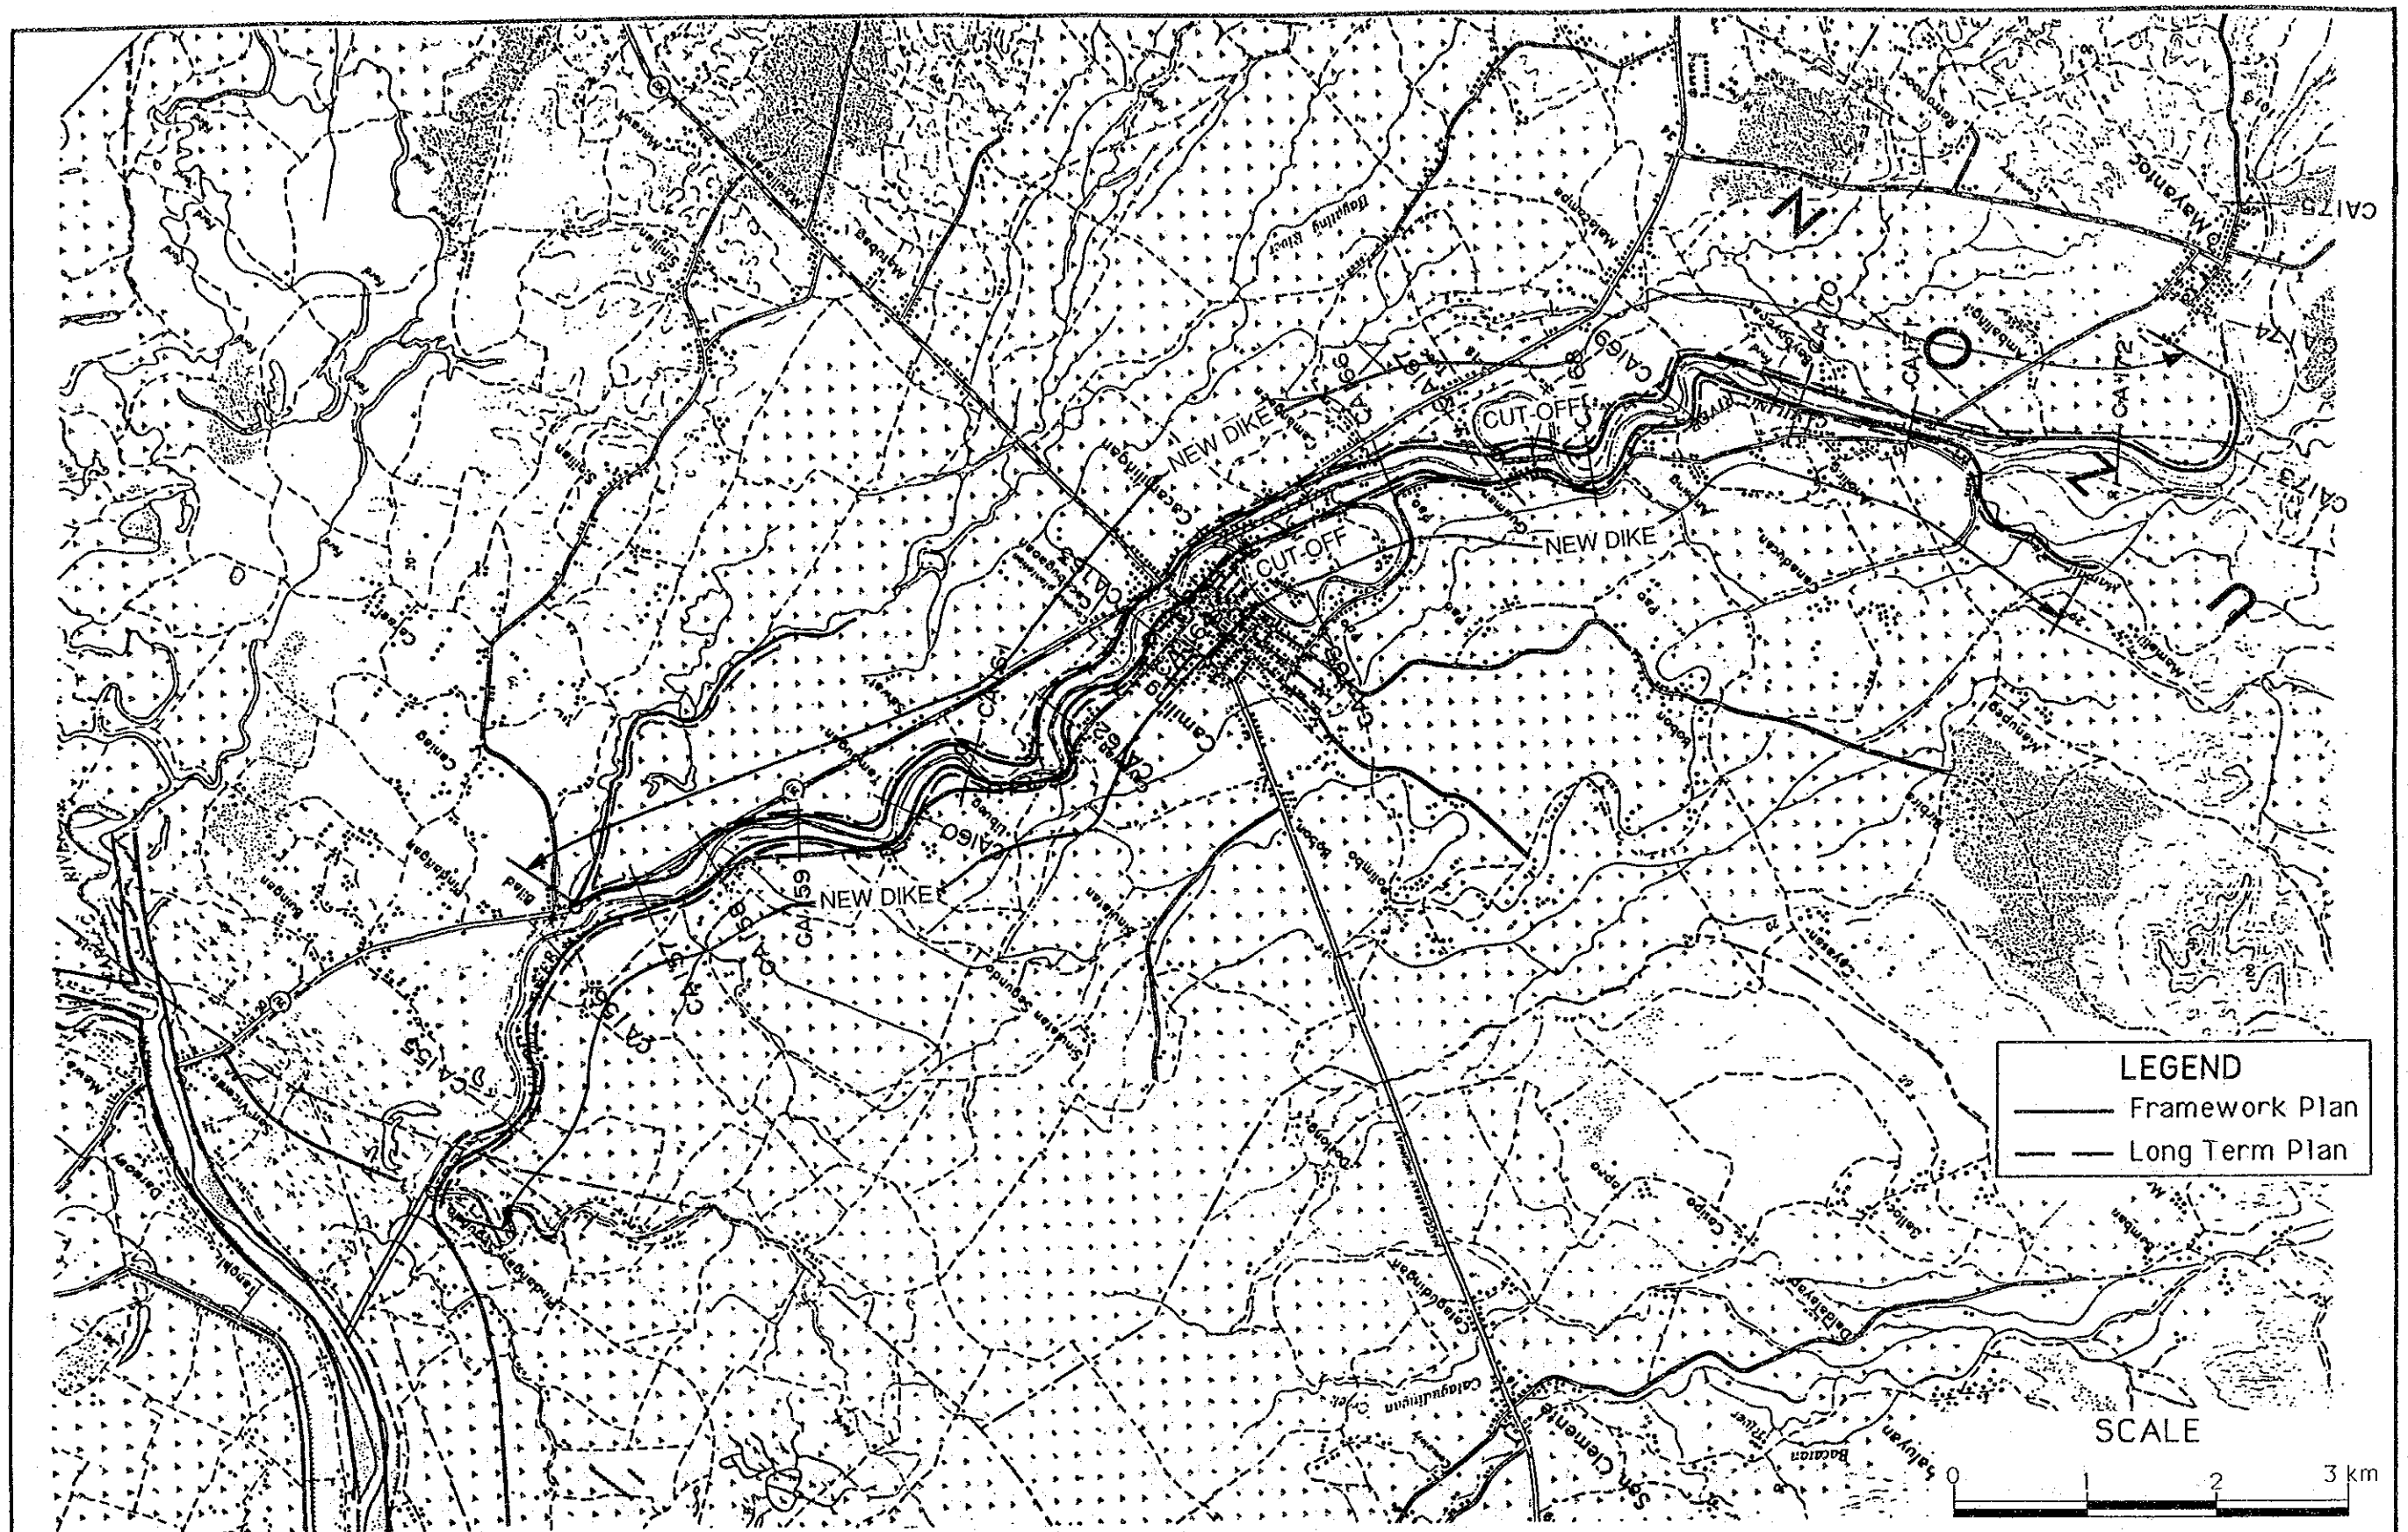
DESIGN PLAN OF CAMILING RIVER
